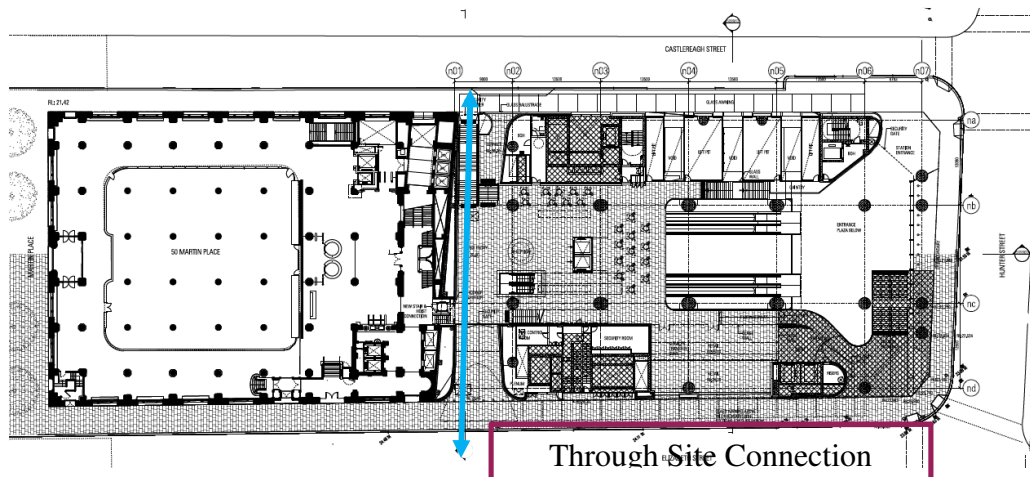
Ground level plan showing 50MP and North Tower access to through site connection
